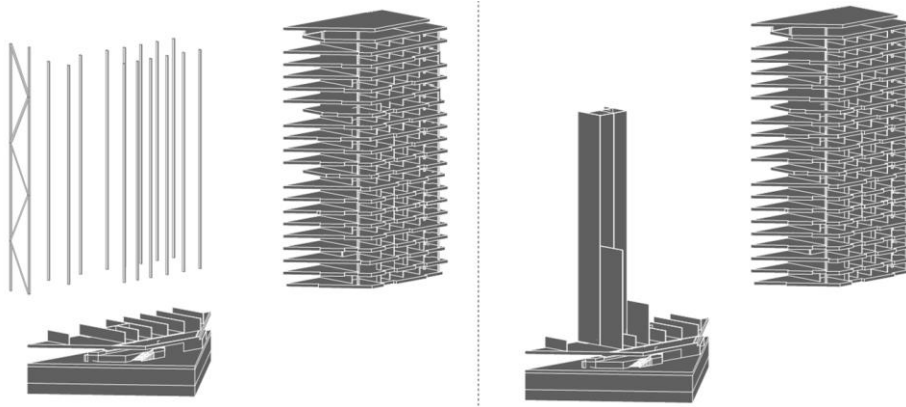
Stability system, steel-timber hybrid (left) and concrete-timber hybrid (right)
